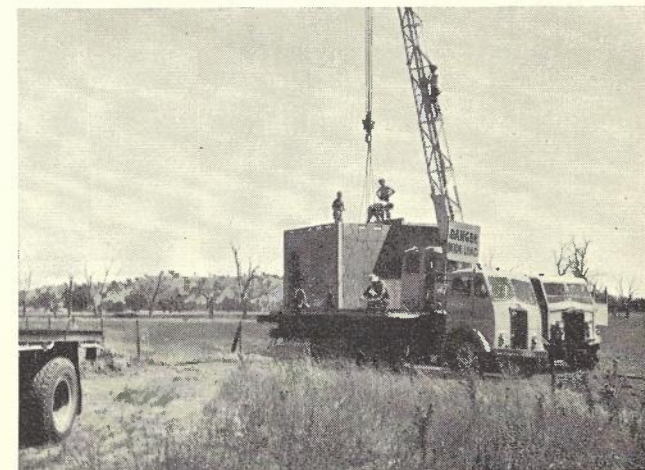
Placing First Section of Roof Unit Into Position (Willie Ploma).
